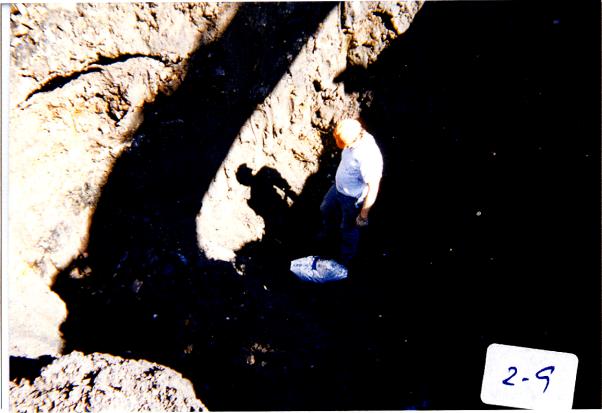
Placing bentenite in well MW-2B. (September 20, 2001)
